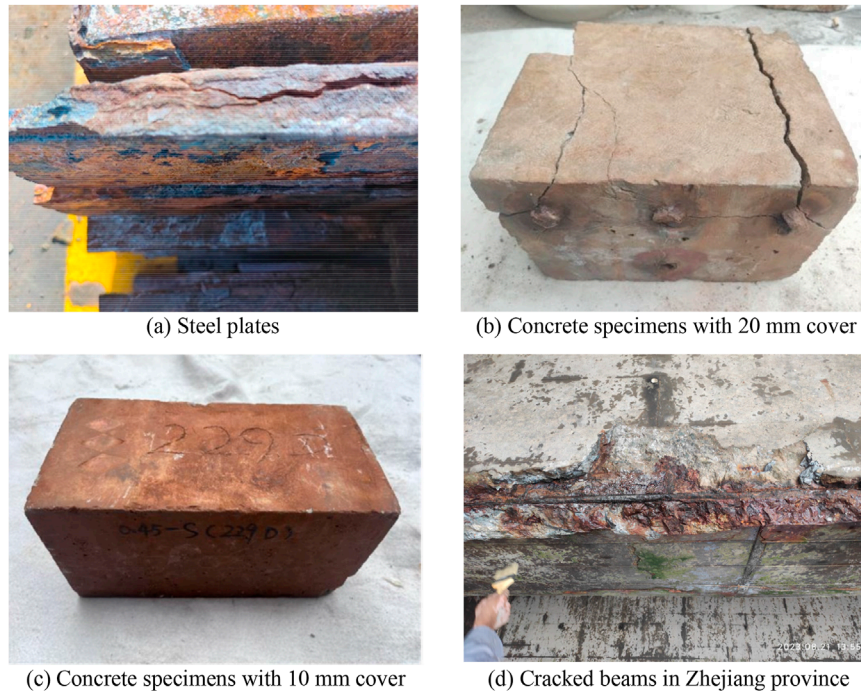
Sources of corrosion products. (A) Steel plates (B) Concrete specimens with 20 mm cover (C) Concrete specimens with 10 mm cover (D) Cracked beams in Zhejiang province.
